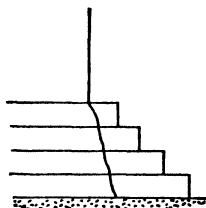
Crack in Footing from Excessive Offsets
